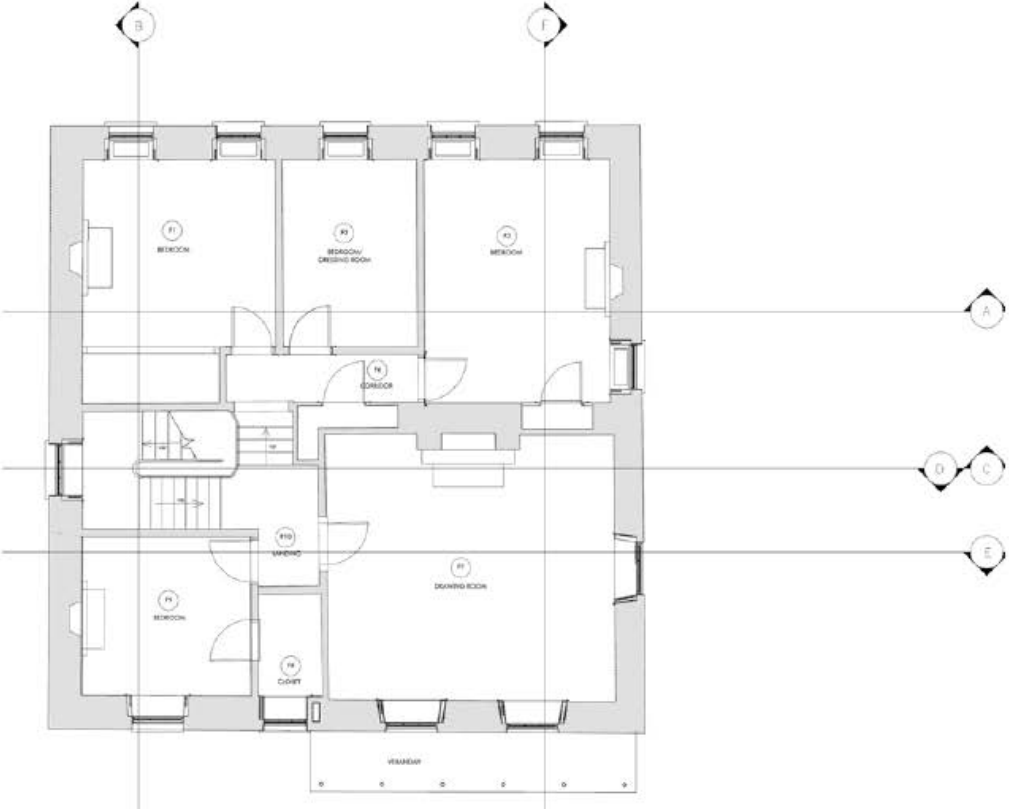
Belmont: Reconstructed plan of first floor in Period 1 (James Hall)
